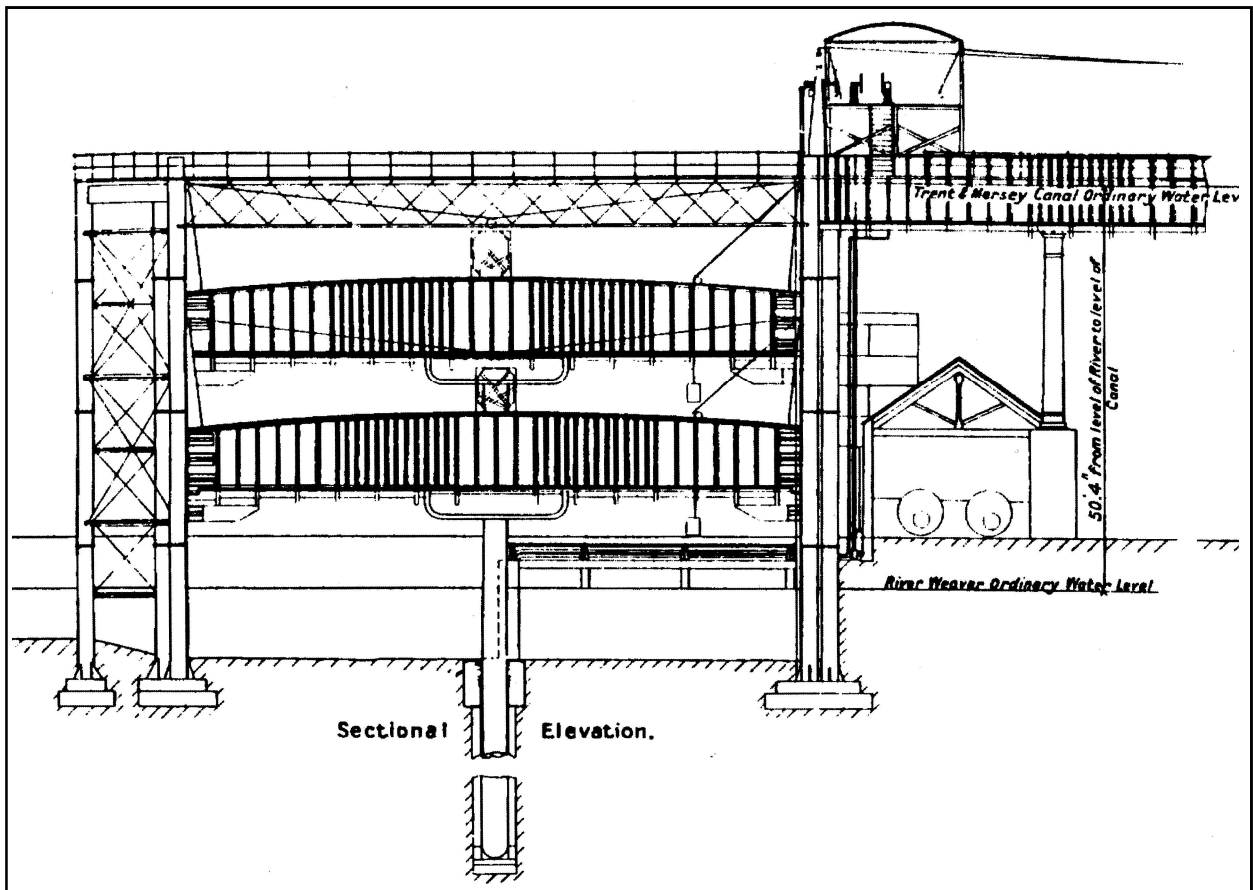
Side Elevation of the Anderton Hydraulic Lift 1875¹⁷
